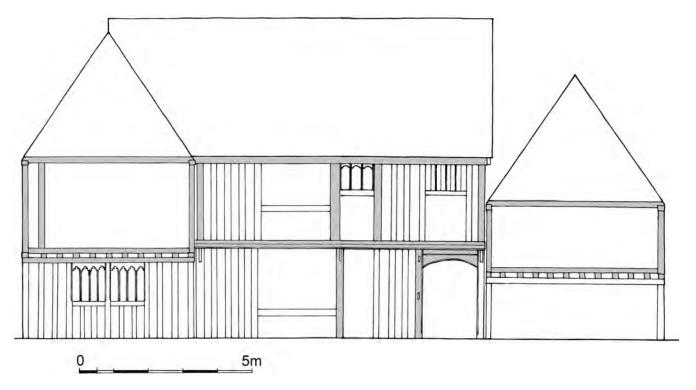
Front elevation of the Swan reconstructed from what is currently visible. Surviving *in situ* timbers are shaded.
